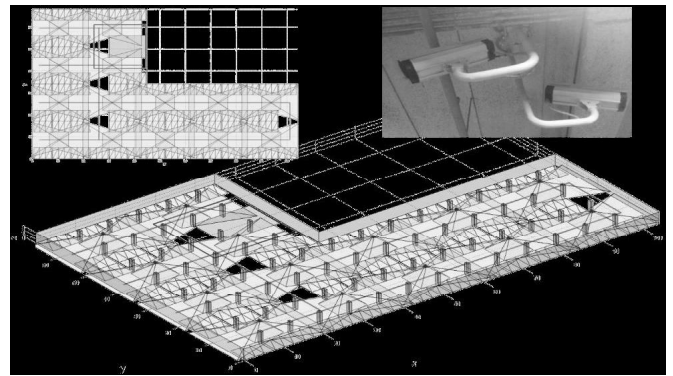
Arrangement of CCTV cameras in an underground parking lot
